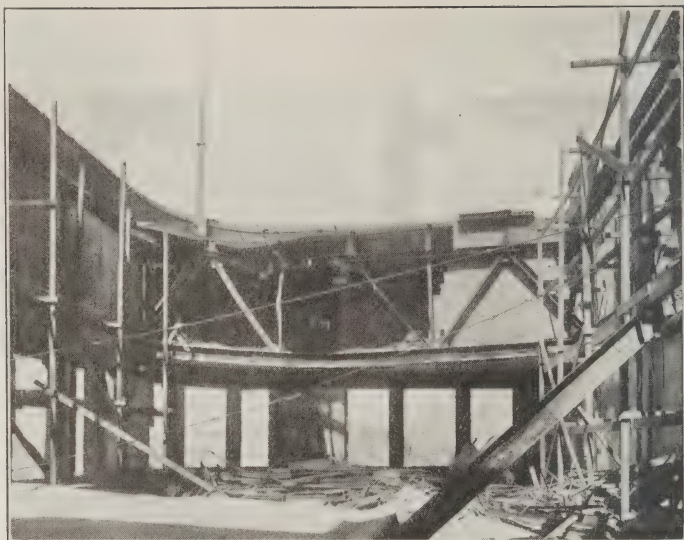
VIEW LOOKING NORTH IN TOP STORY
